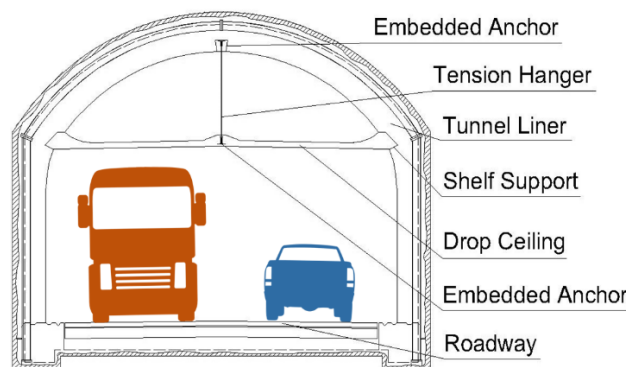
Representative tunnel with a drop ceiling in a horseshoe cross-section
